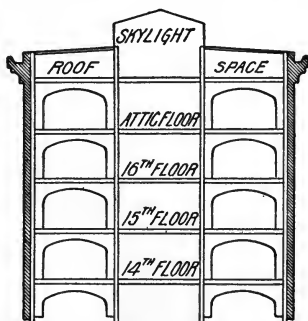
Cross-section showing Portals in Old Colony Building.
